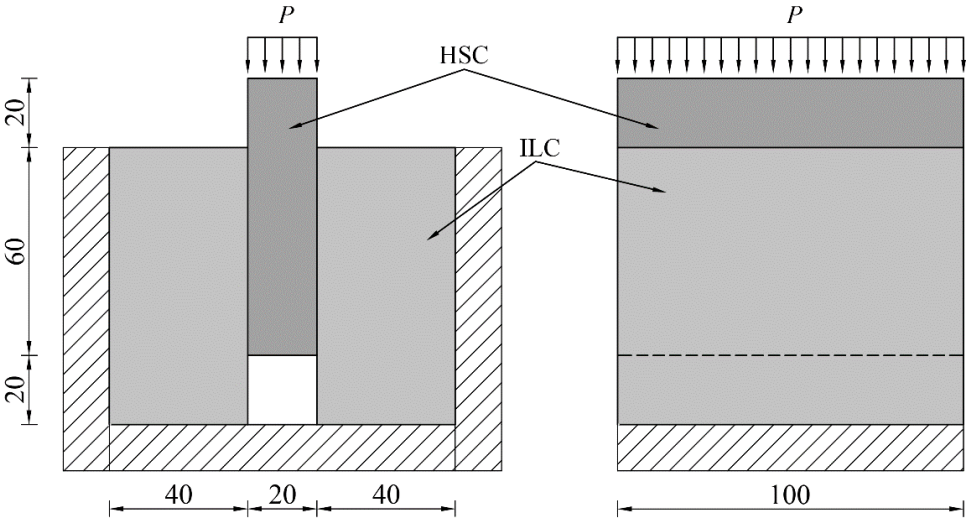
Schematic plan of ILC-HSC push-out test specimen (unit: mm)
